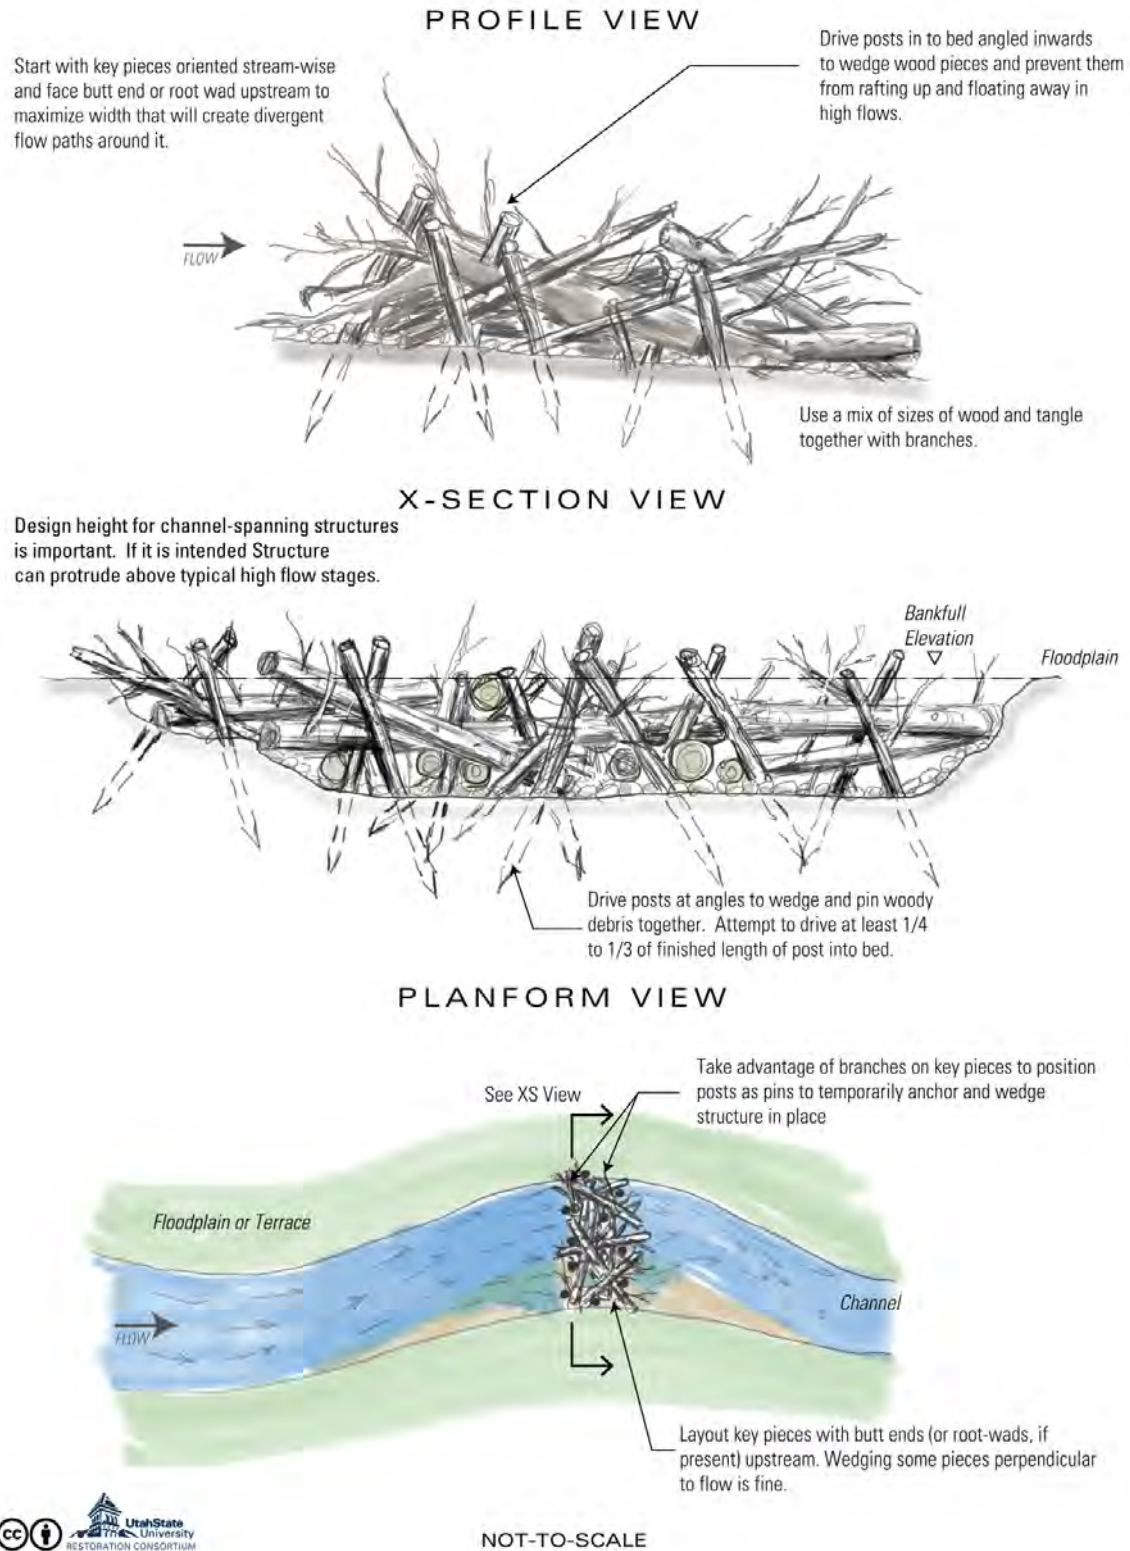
Profile, cross-sectional, and planform views of typical channel spanning PALS (from Wheaton et al. 2019).
